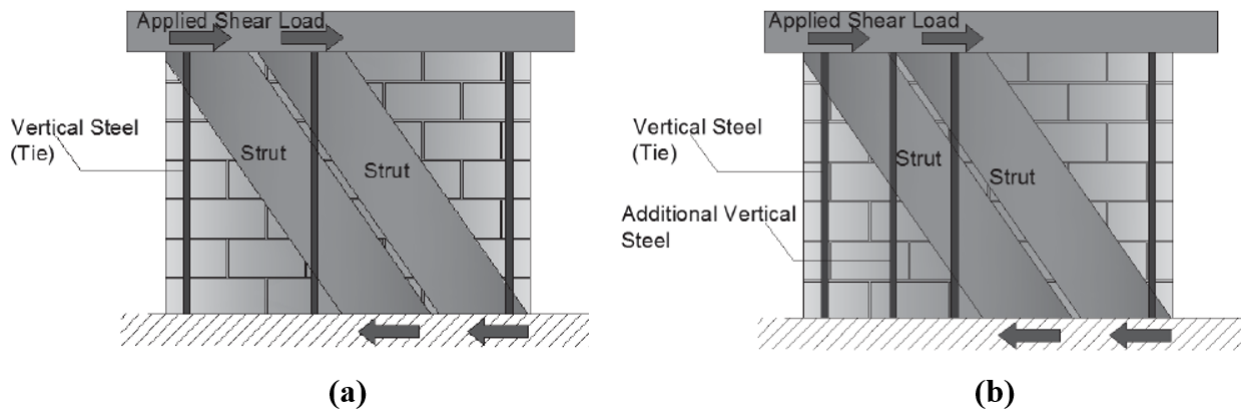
Effect of vertical reinforcement spacing of PG walls with (a) normally spaced reinforcement, and (b) very closely spaced reinforcement (adapted from Hassanli et al., 2014)
